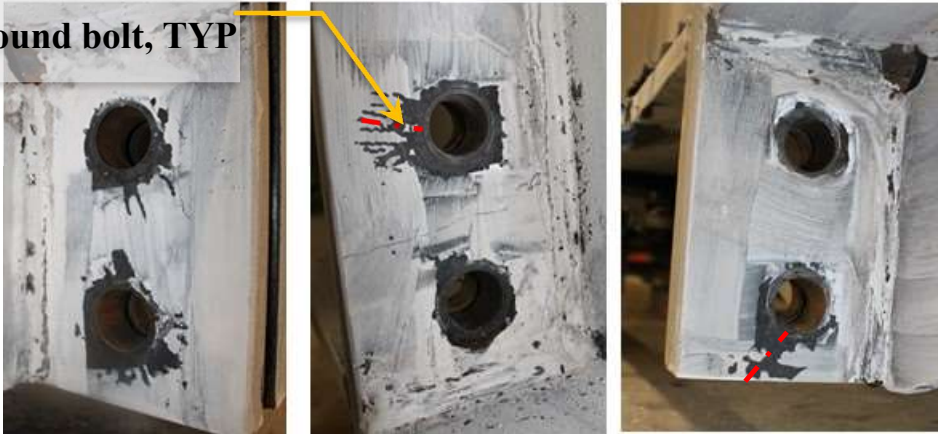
Three views of the specimen 8ES-1.00-1.00-56 and zoomed in views to show local yielding around the bolts, at the end of the test
